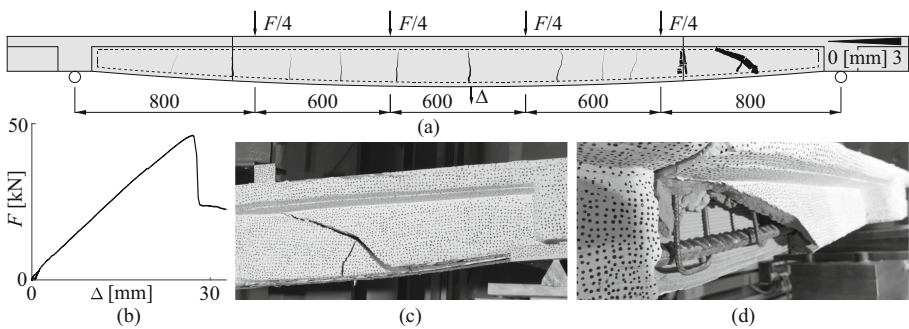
Structural behaviour of the beam: (a) Crack pattern of the beam at peak load generated with ACDM [12, 13]; (b) Load-deformation behaviour of the beam; (c) and (d) Images from the critical shear crack and the failed beam.
